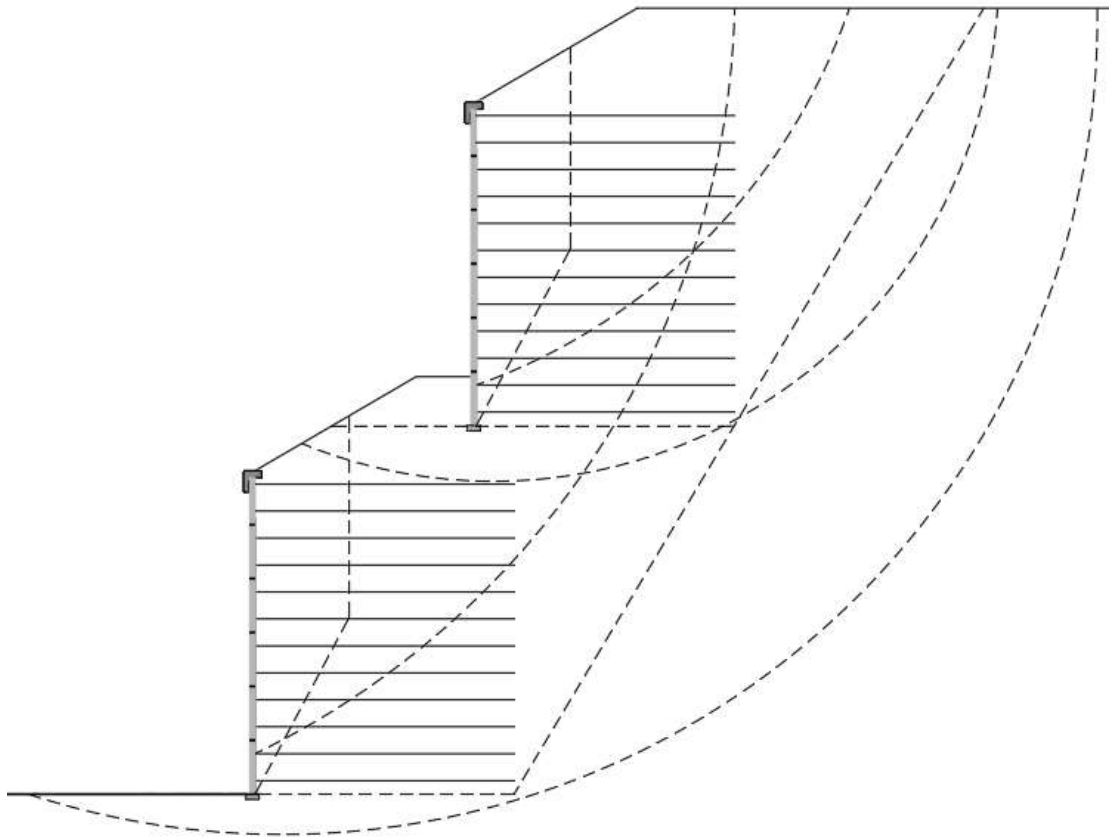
Typical Failure Surfaces for a Two-Tiered MSE Wall
